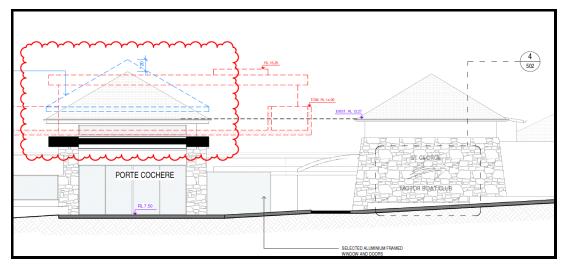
Proposed new roof over entry (Source: Innovate, Revision F)
